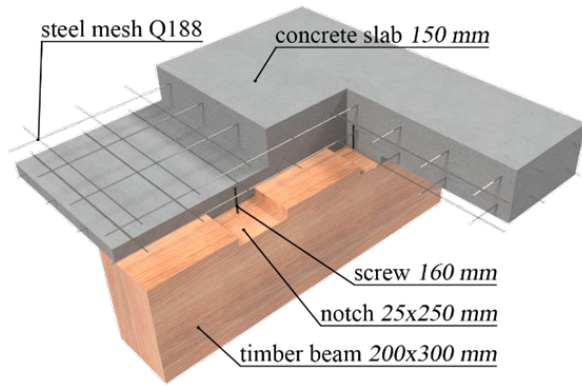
A notched shear connection. The connection was rebuilt based on [88]
